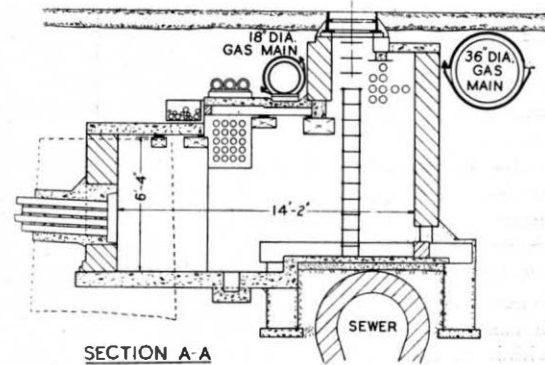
MANHOLE FOR LONDON WALL AUTO. TRANSFER.
